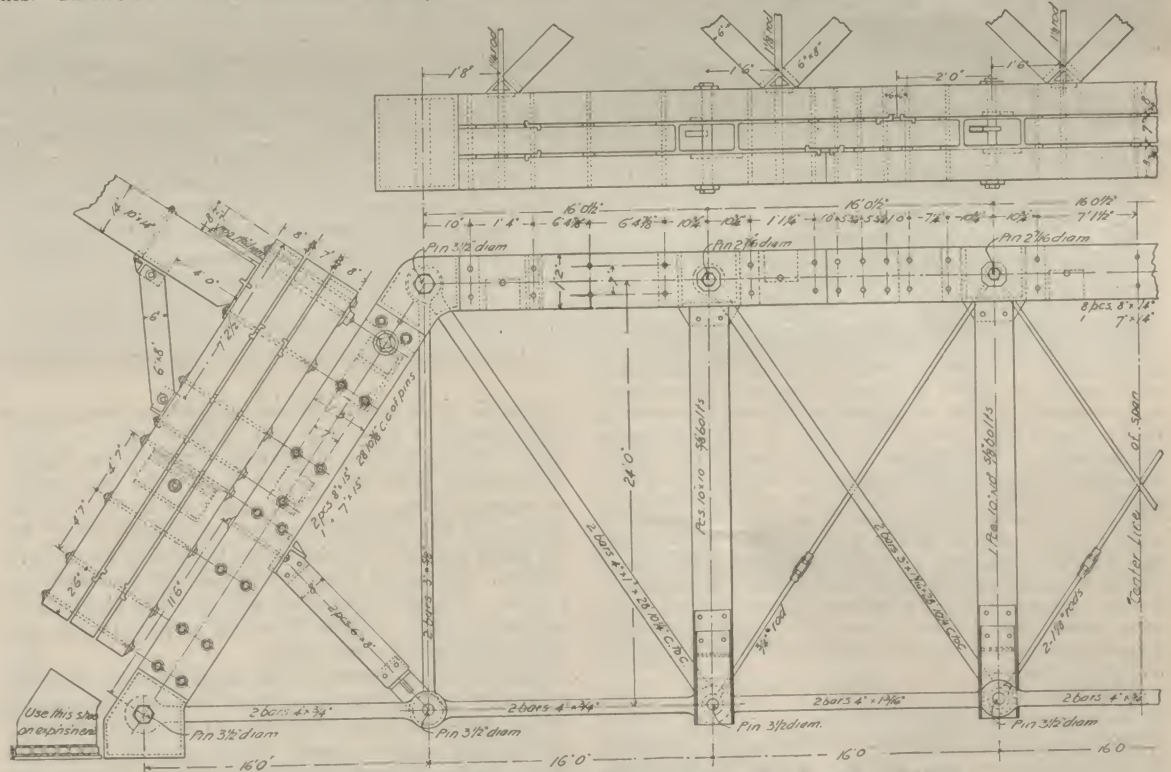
PLAN AND ELEVATION OF ONE HALF OF TRUSS.
